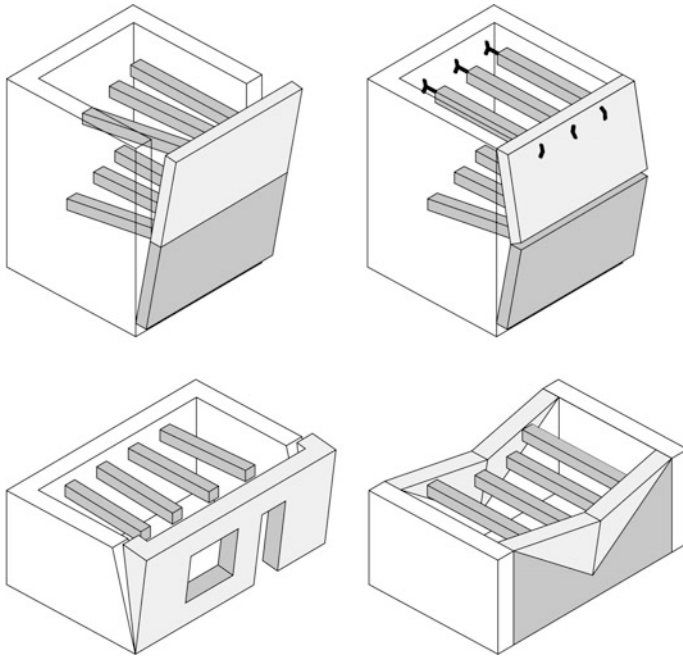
Wall overturning modes due to inadequate stiffness of the floor [87]
